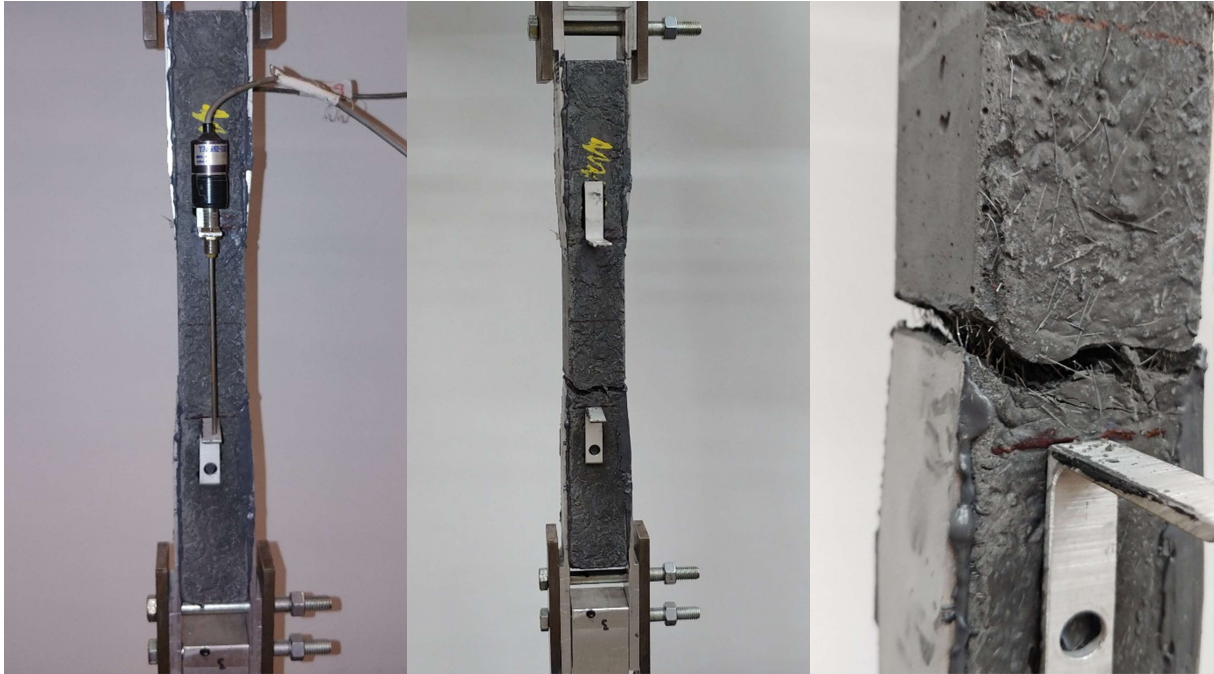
8 Crack pattern 2% steel fiber content Specimen 2
